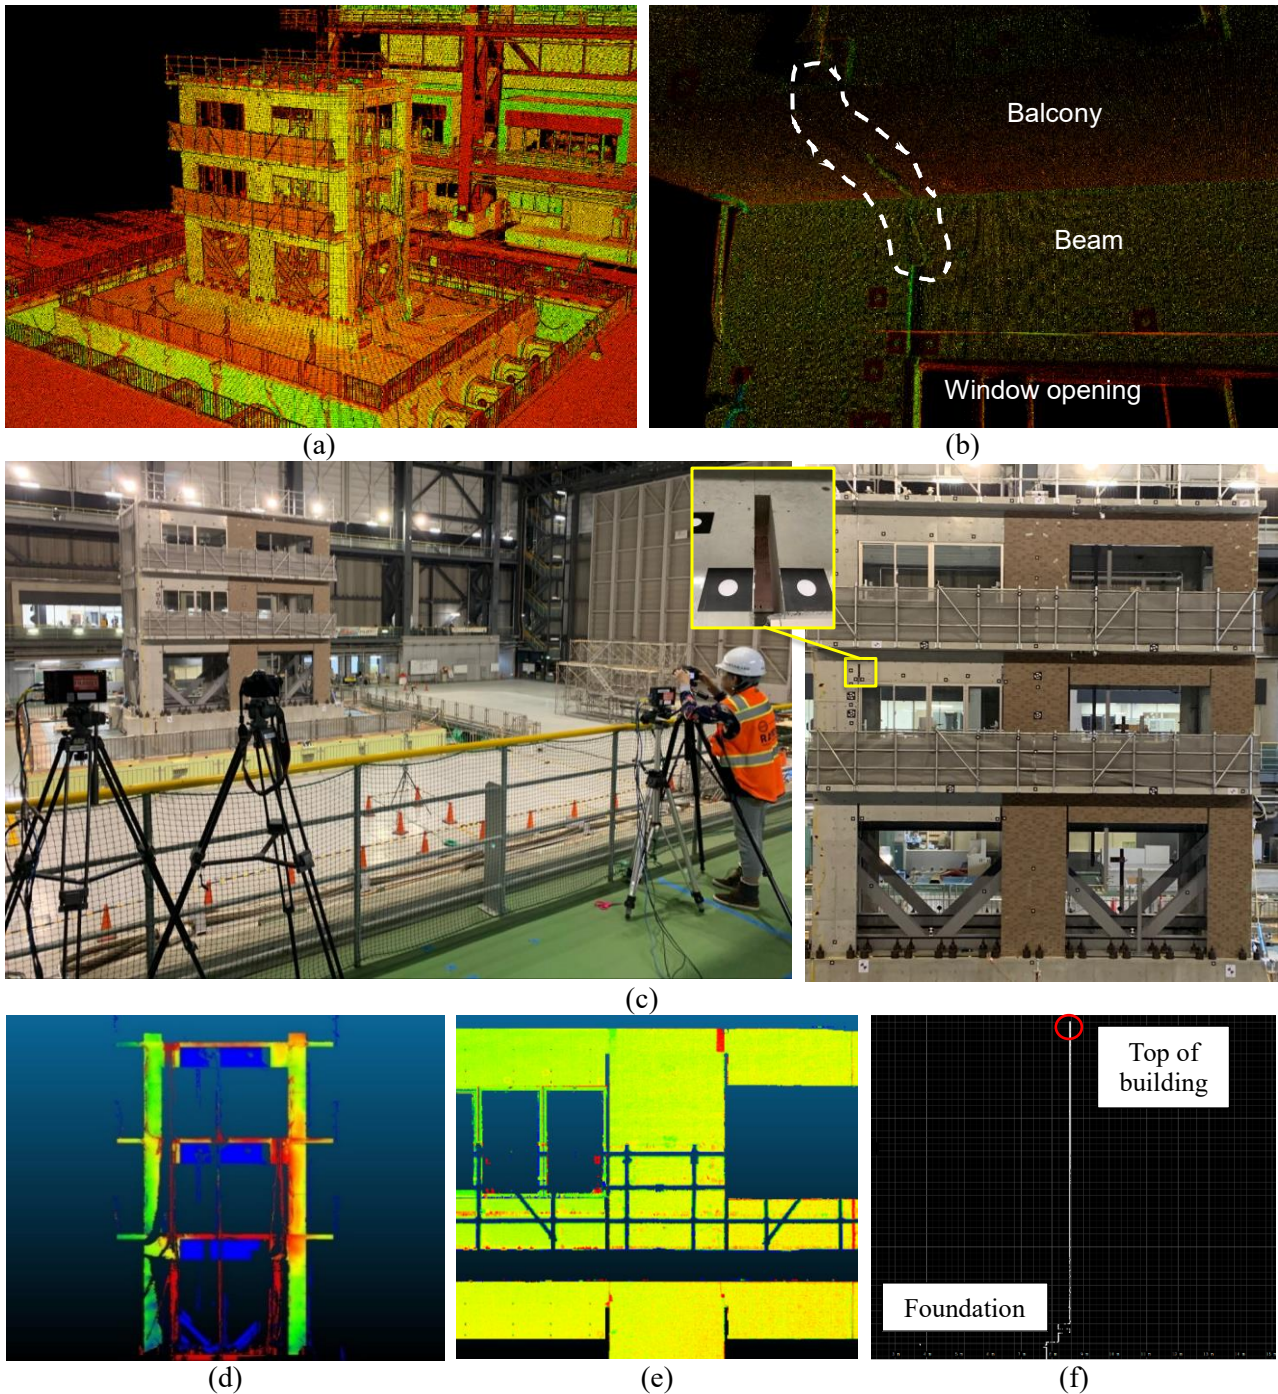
Laser scanning and motion tracking examples; (a) point cloud density of specimen, shake table, and laboratory, (b) high-resolution scale of crack initiating from hanging-wall gap, (c) camera setup for TT-DIC monitoring, (d) residual deformation of building, (e) detecting tile damage, and (f) dynamic tracking of specimen response
